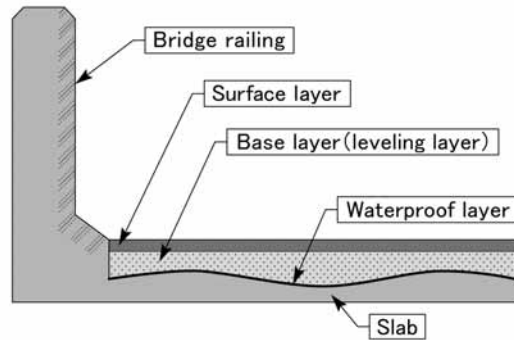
Structures of railing, slab, waterproof layer, base layer and surface layer
